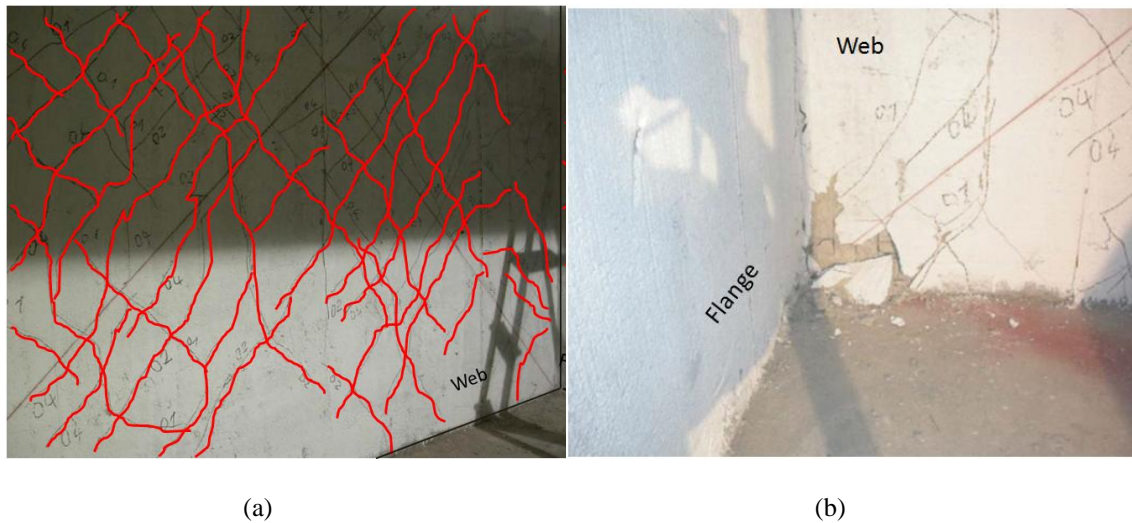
(a) Cracking pattern at the end of the test for HSW specimen; (b) detail of concrete spalling at the corner of the web panel for HSW specimen.
